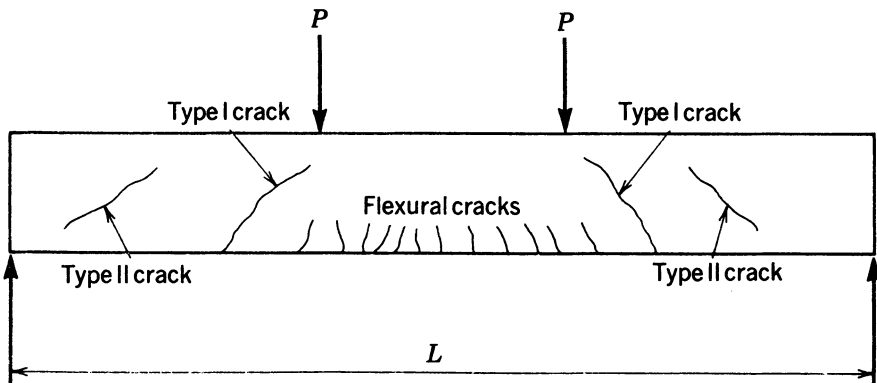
Illustration of flexural cracks and Types I and II shear cracks.
